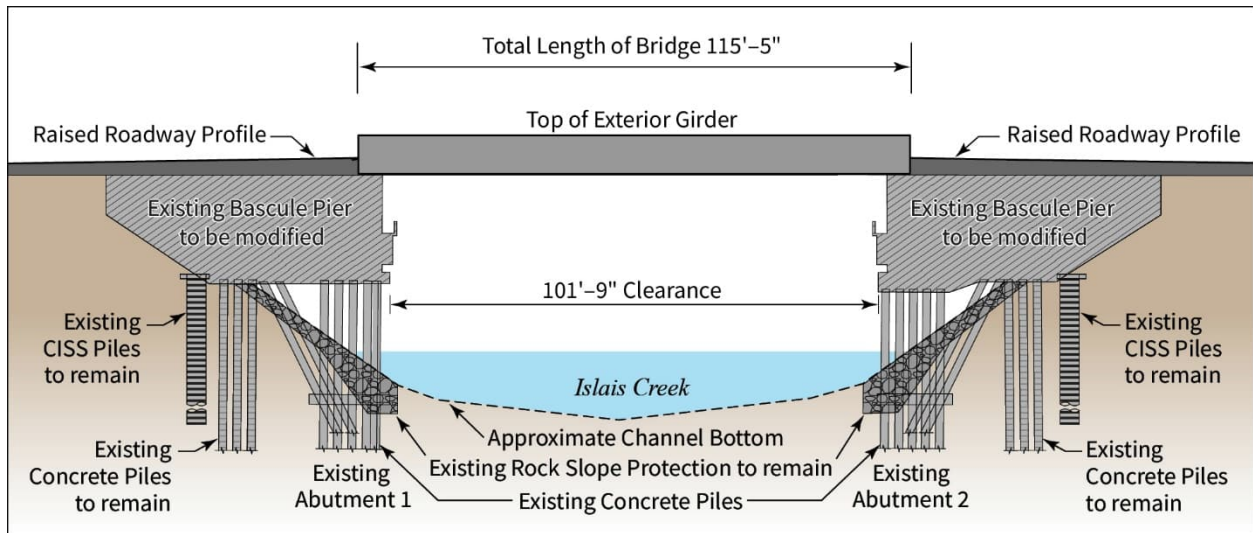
Proposed Through-Girder Bridge Longitudinal Section
